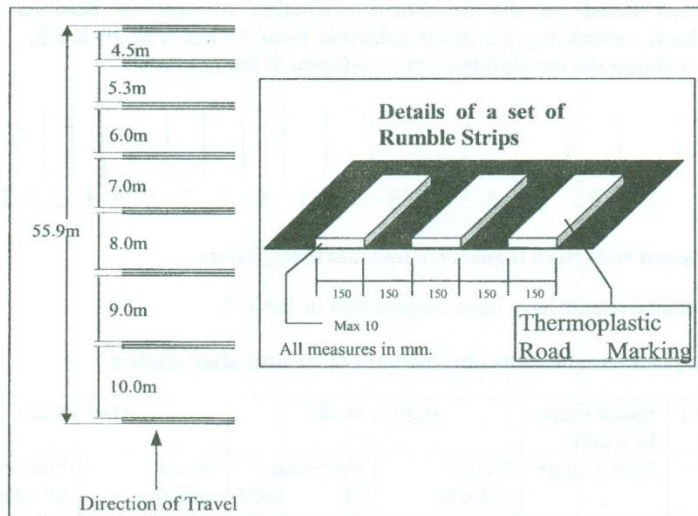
Typical layout of a system of rumble strips on a road section with a speed limit of more than 50 km/h.
